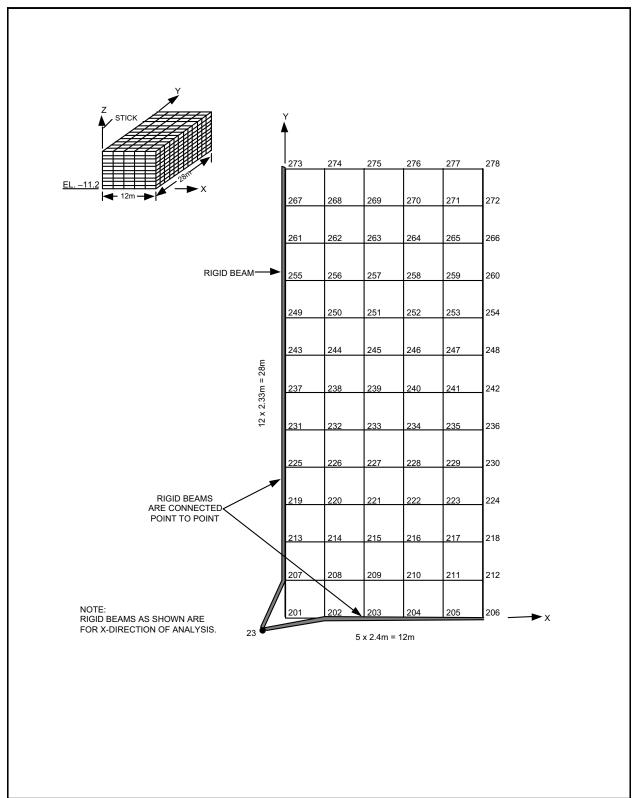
A-33 UB Case: Nodal Points at Elevation –11.20m
